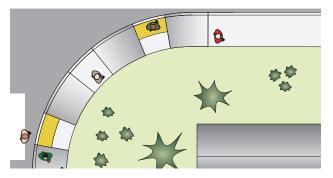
Ramp placement on narrow curb tight sidewalk
